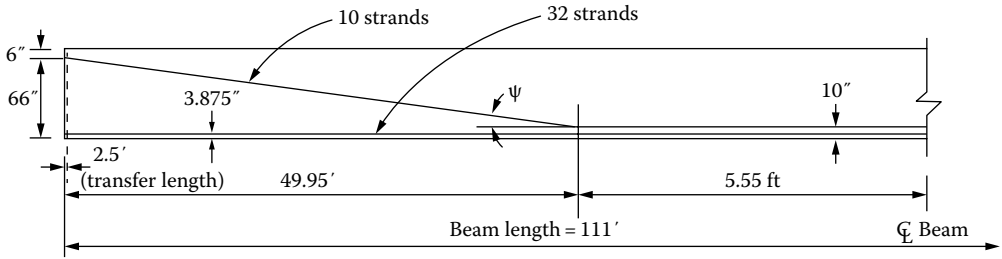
Location of c.g. of strands at midspan and at ends. (Adapted from PCI, *Precast Prestressed Concrete Bridge Design Manual*, 1st ed., Precast/Prestressed Concrete Institute, Chicago, IL, 2003.)
